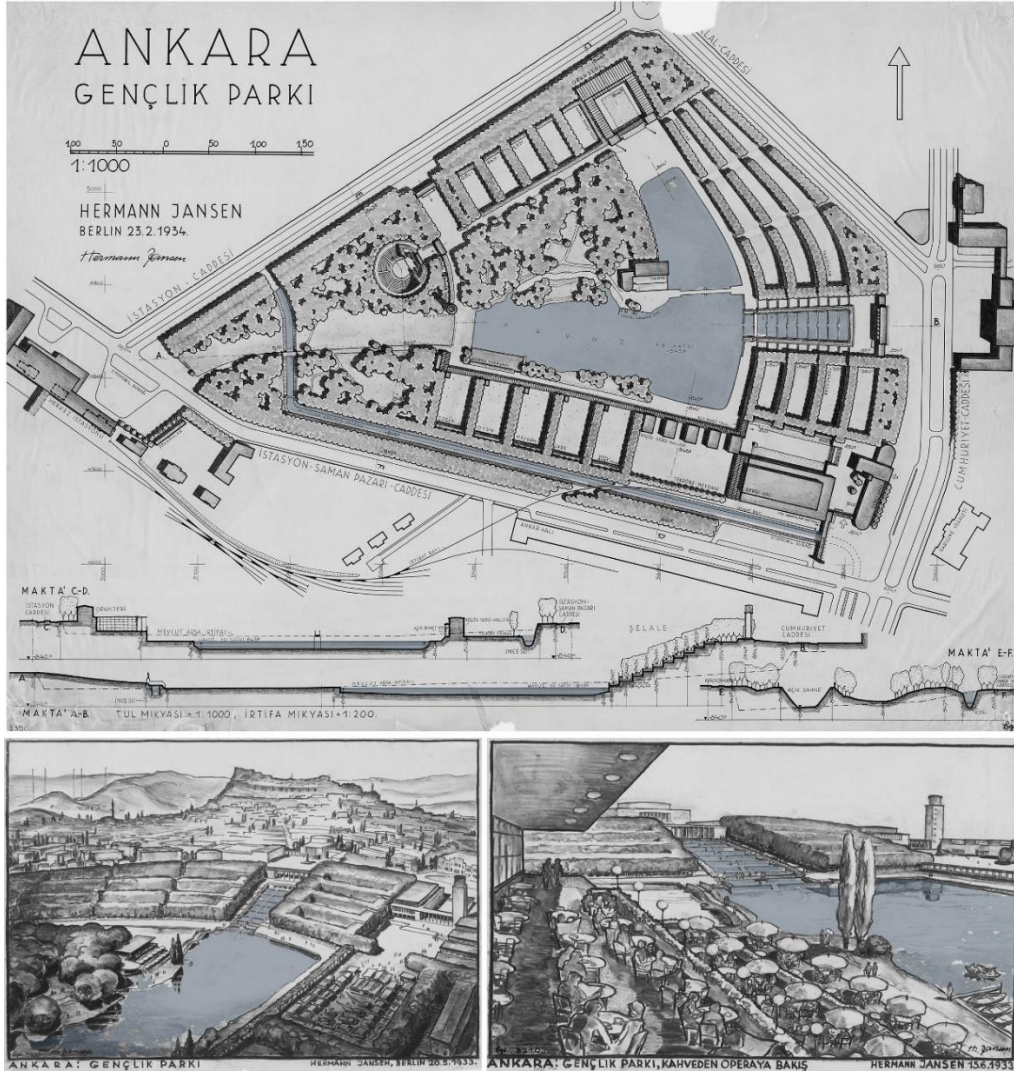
The plan, sections and drawings of Gençlik Parkı by Jansen (Architectural Museum of Berlin Technical University)
